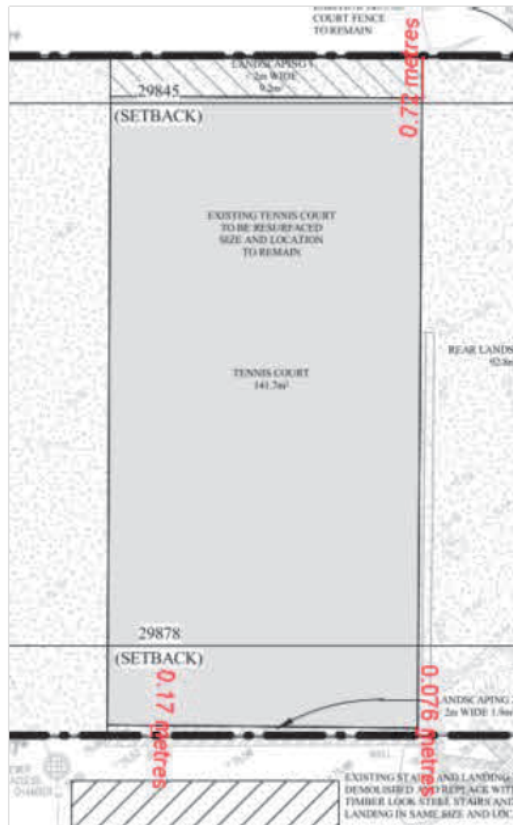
Excerpt from Proposed Site Plan (source: Architectural Plans by Dellview Designs)
